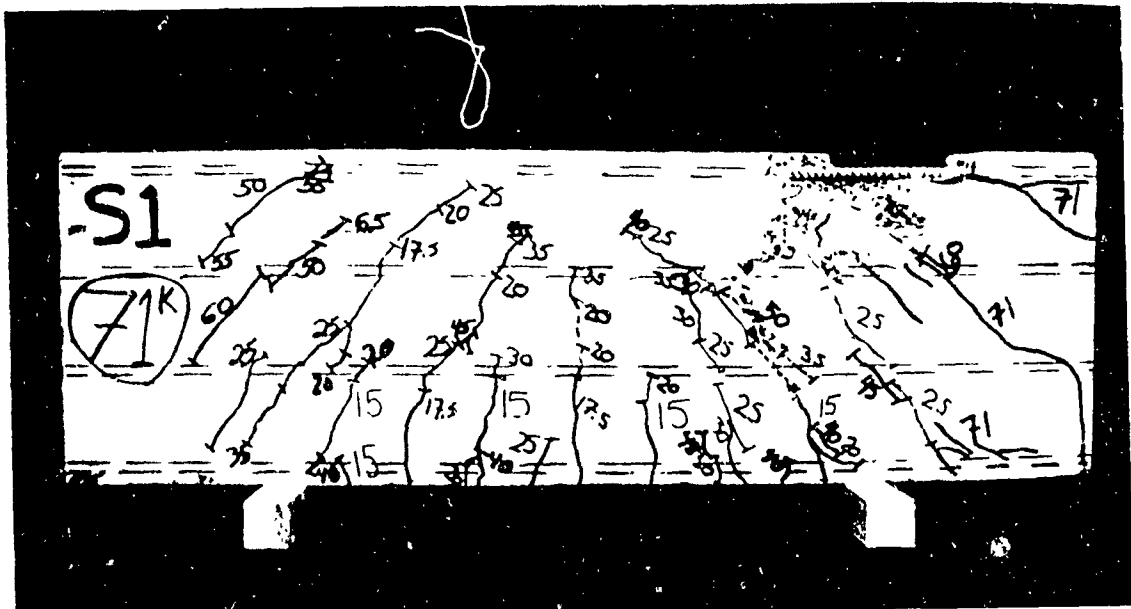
Cracking pattern for sample S1 (failed at 35.5 kips or 158.0 kN)
